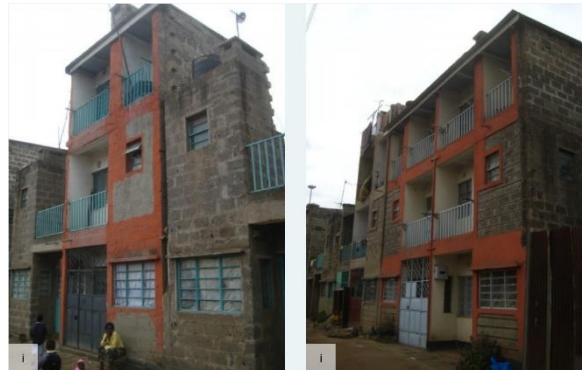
Elevation of the houses showing the vertical incremental building strategy.
